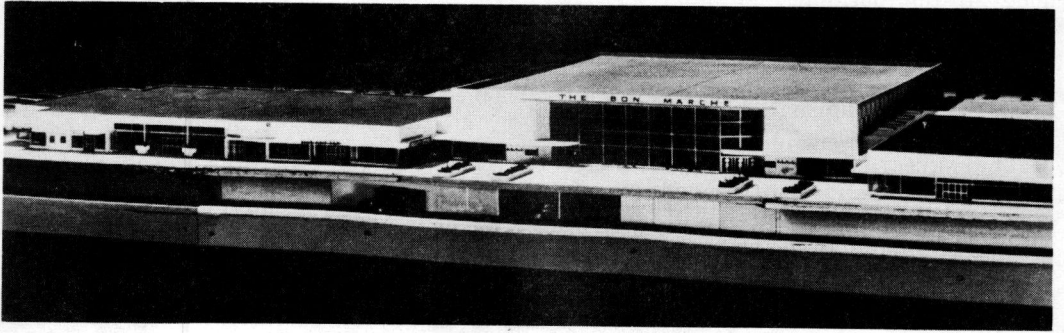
A cross-section of the center pedestrian mall and underground truck concourse, at the Northgate Shopping Center, Seattle, Washington. ---Courtesy John Graham & Company, Architects and Engineers, and The Northgate Company.
